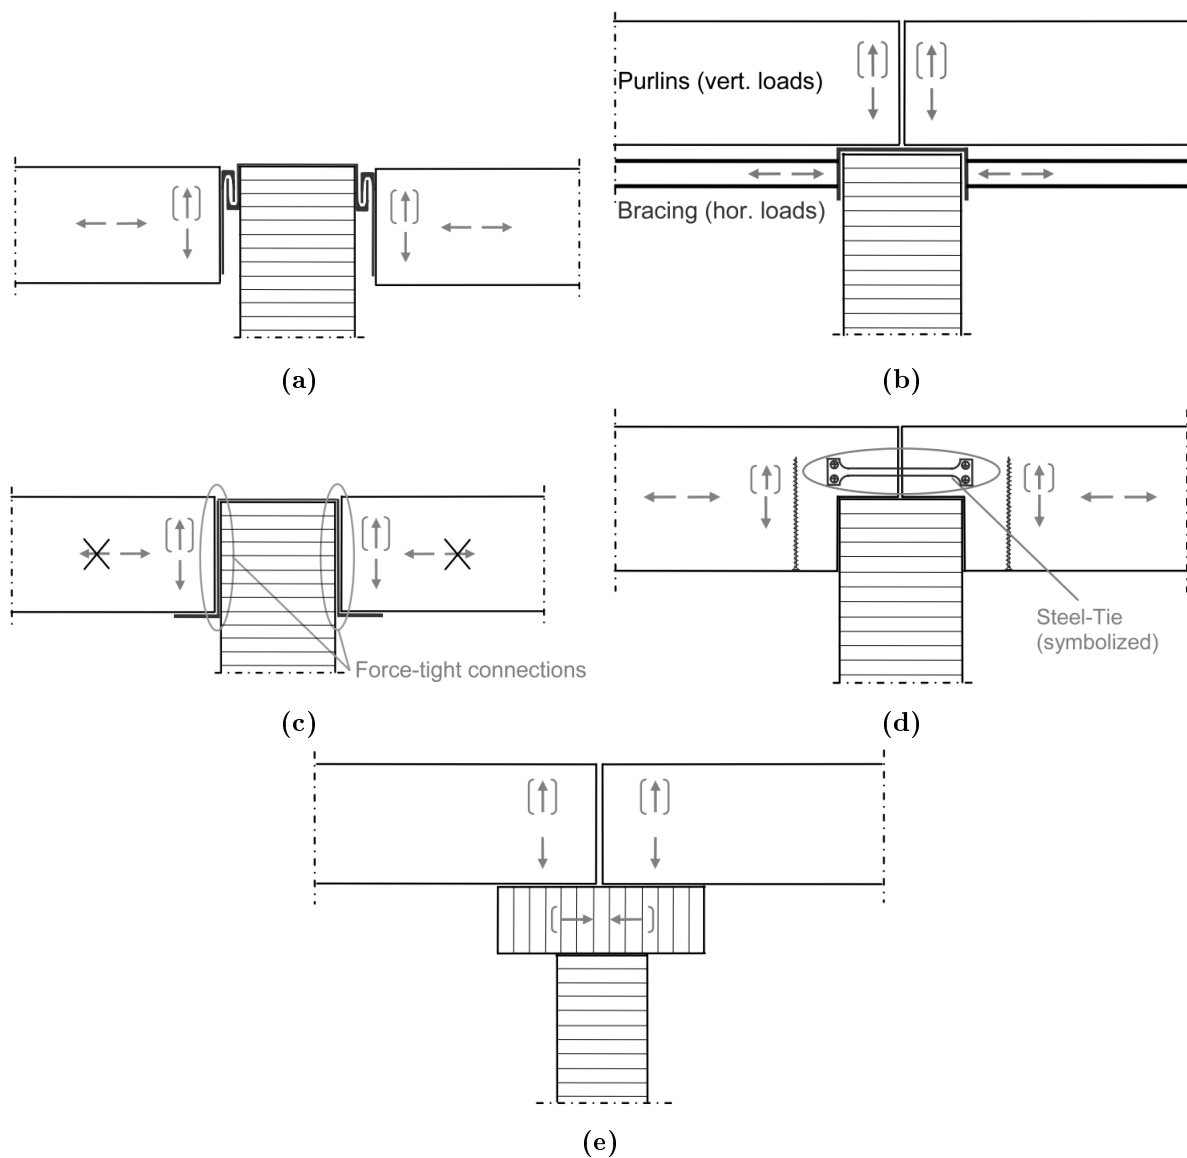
Possible purlin to girder connection details enabling detachment according to [25]; (a) connection to transfer horizontal and vertical loads, potentially enabling detachment in case of failure; (b) separation of load bearing structure for horizontal and vertical loads, enabling detachment in case of failure; (c) connection to transfer axial compression forces and vertical loads, enabling detachment in case of failure; (d) connection to transfer axial tension and compression forces and vertical loads, enabling detachment in case of failure; (e) primary beam with cross-section to enable internal stability against lateral torsional buckling, also capable to transfer external horizontal loads (e.g. wind loads).
